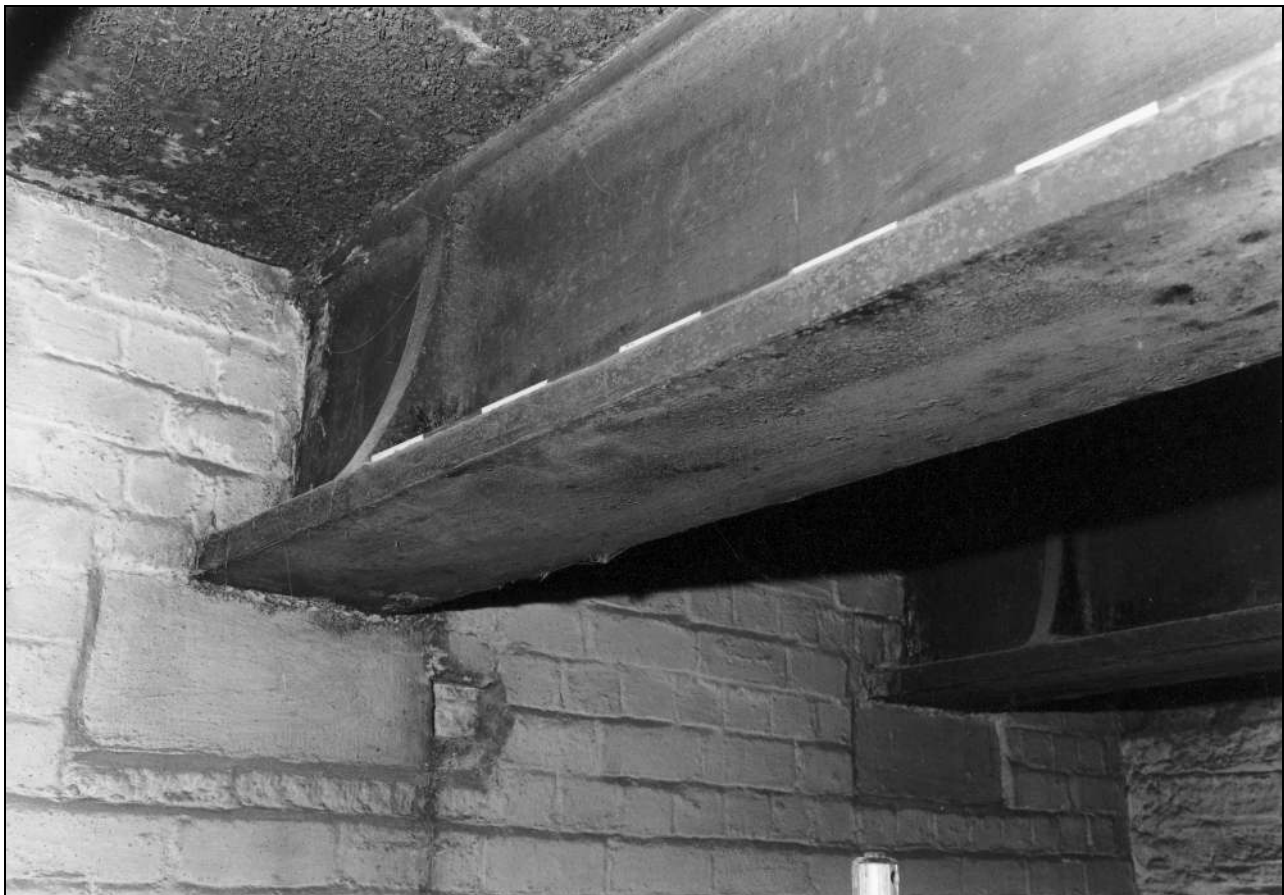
Bay 4: detail of cast iron beam supporting tank (film 8, frame 1)
